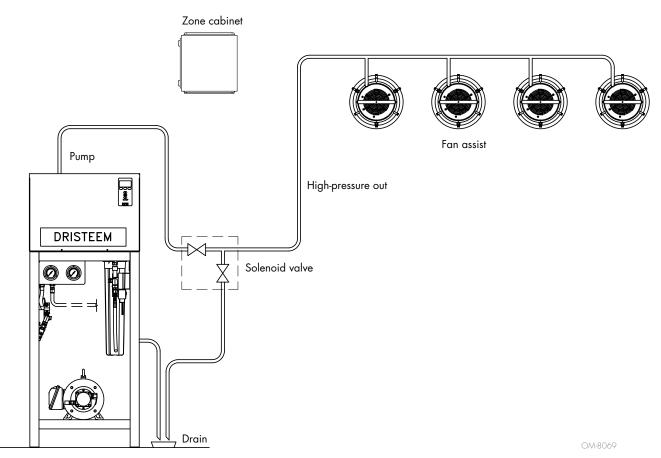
PLACEMENT OF FAN-ASSISTED (FA-3 AND FA-4) FOR CEILING ARRANGEMENT
